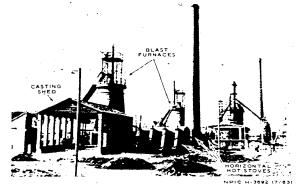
BLAST FURNACE SECTION OF A SMALL IRON AND STEEL PLANT UNDER CONSTRUCTION
